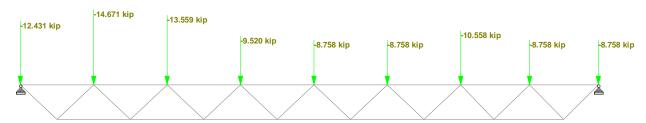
STAAD Model of Smaller Truss Showing Loading Diagram
